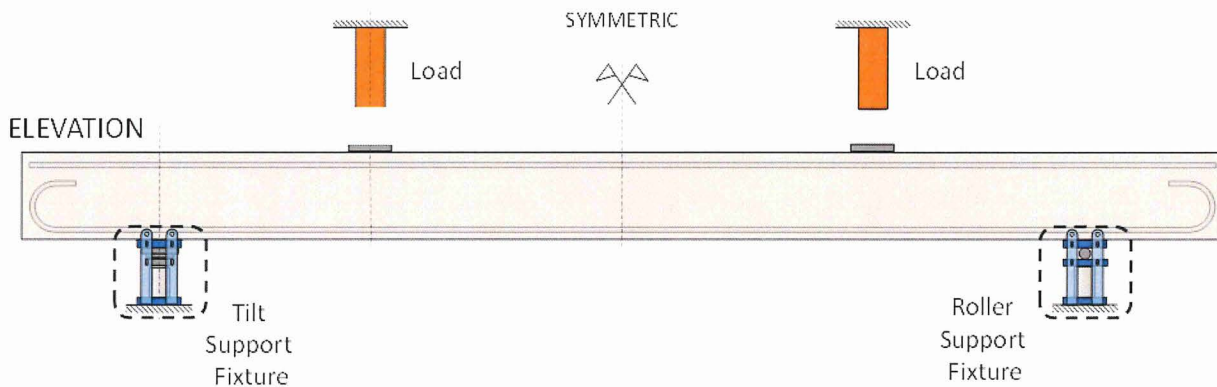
Test Setup for Reinforcement Anchorage Test Specimens (Elevation View)
